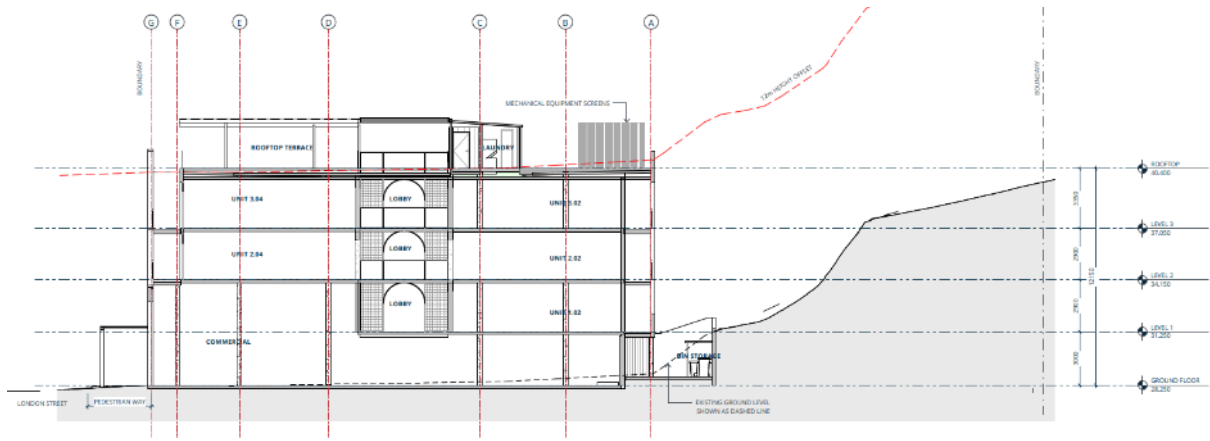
RMA/2022/801 – Side elevation (east) - a consented 4 storey development with lightweight roof terrace. Equivalent in height to the former Harbourlight Theatre, located on the subject site at 24 London Street. (See Appendix 3 for more detail), with artists impression of the proposed building within the adjacent built context.
